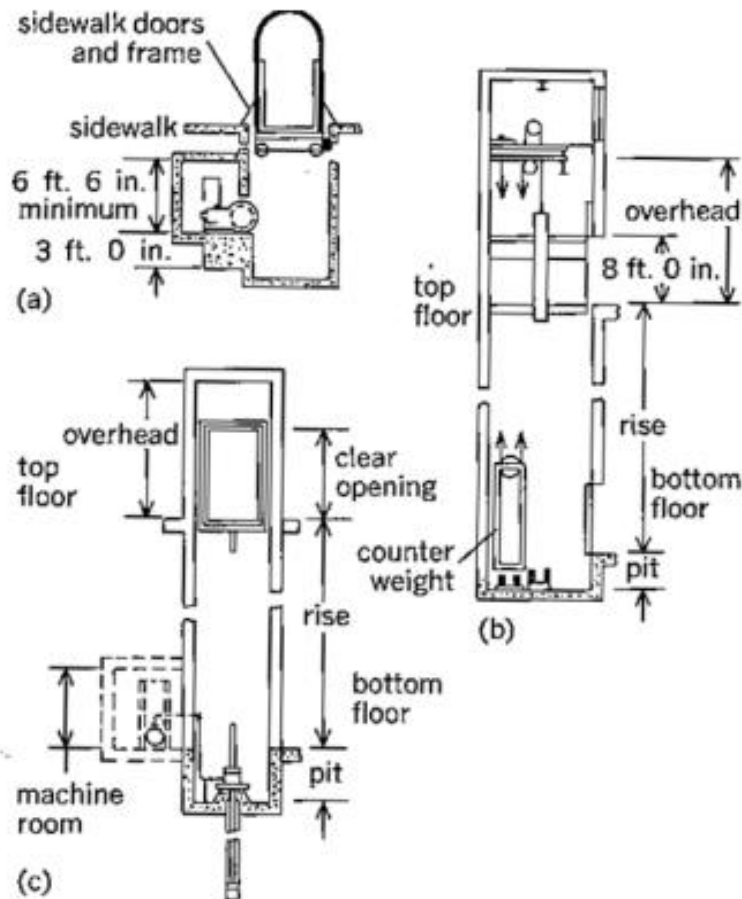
Three types of industrial elevator. (a) Side-walk elevator. (b) Heavy-duty freight elevator. (c) Hydraulic electric elevator
